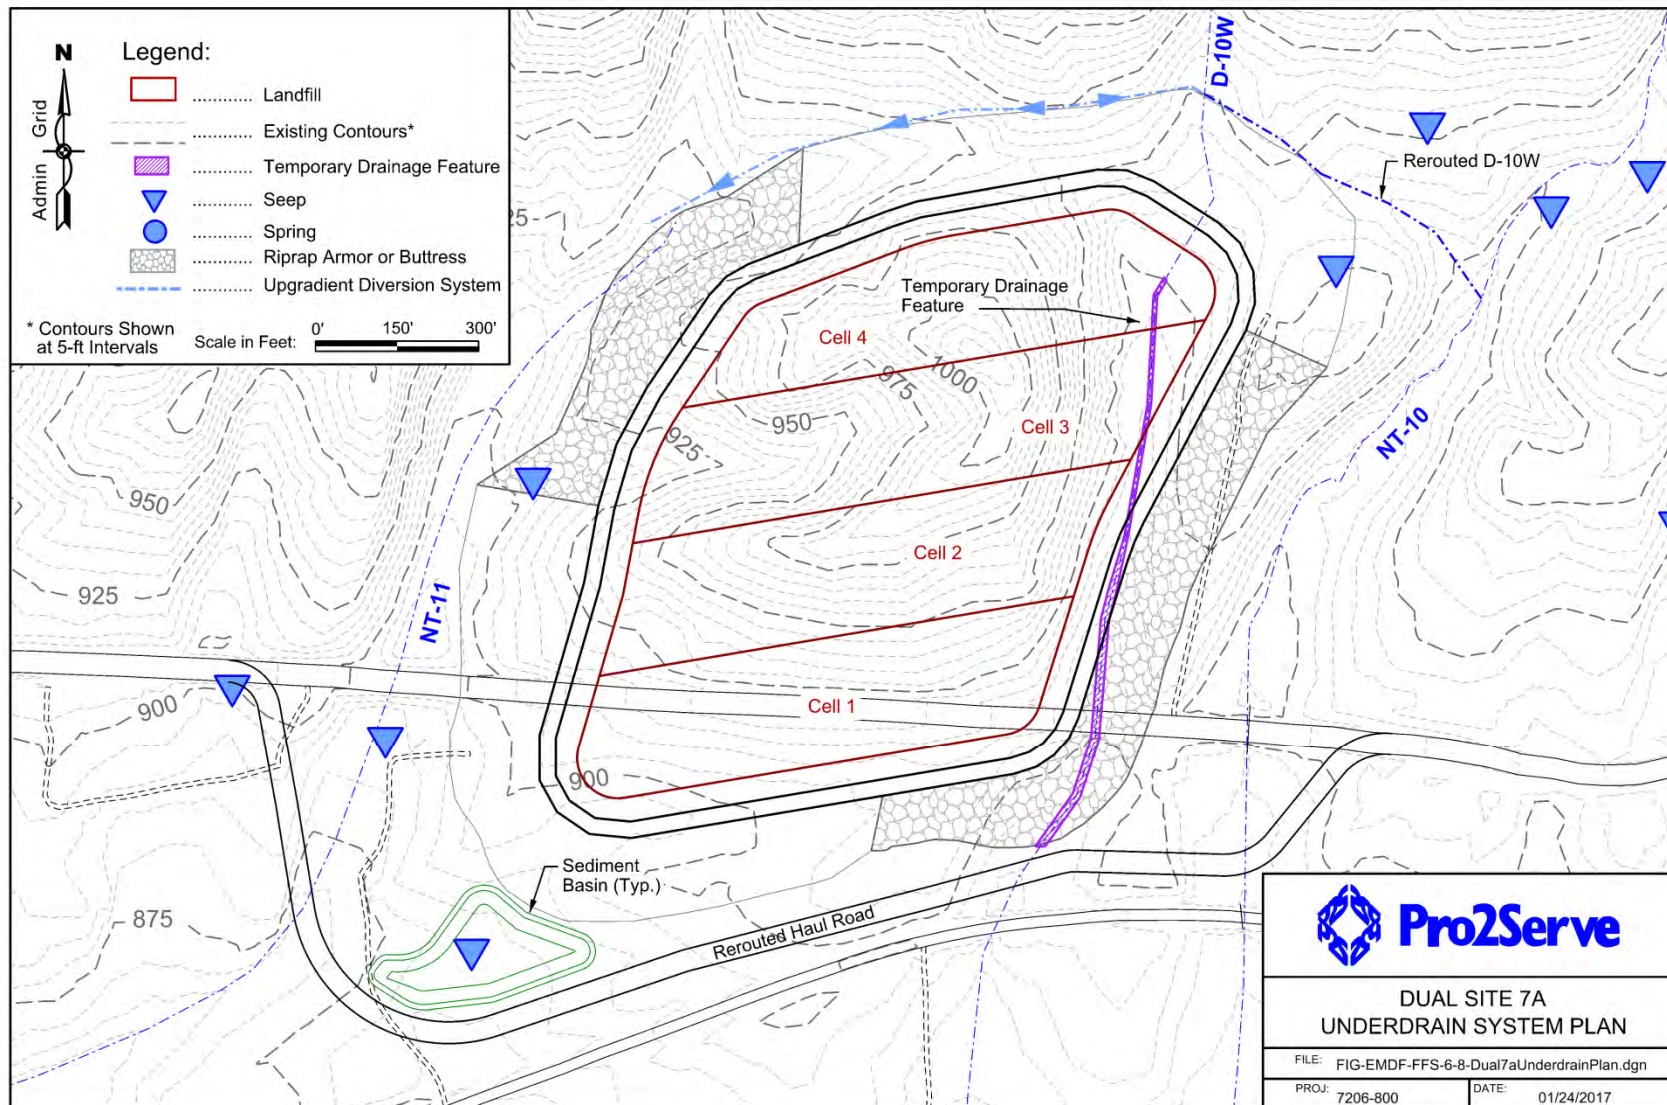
Dual Site, Site 7a, Drainage System Plan
